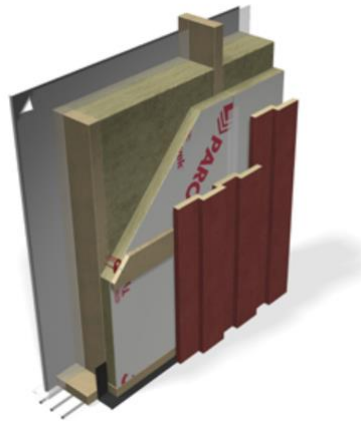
Nordic wall with cladding (Paroc, 2021).
